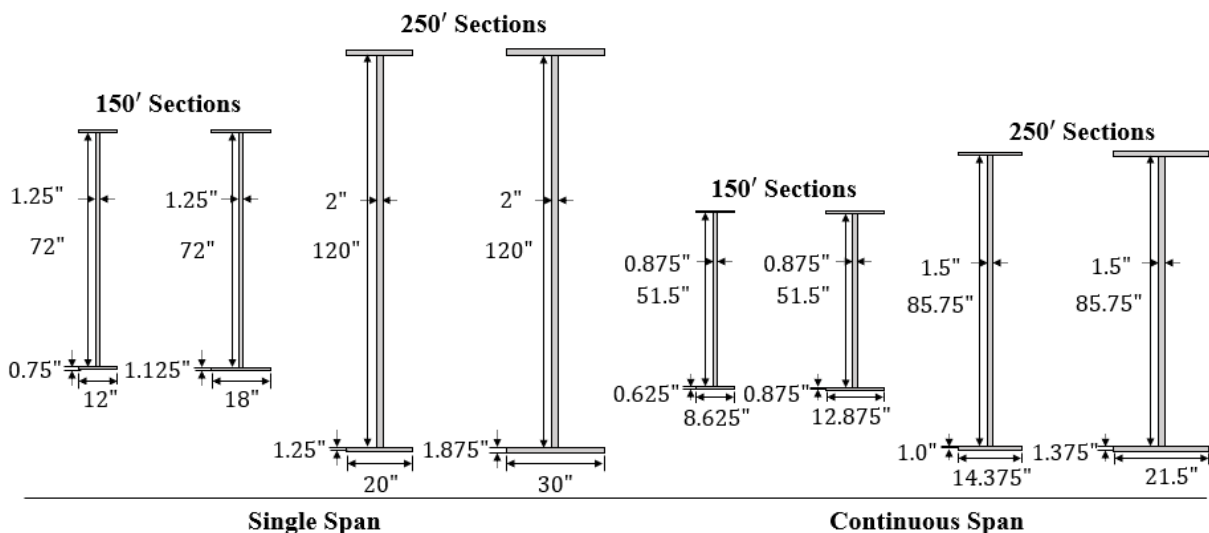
Girder Sections Used for Bridges in Initial Parametric Study
